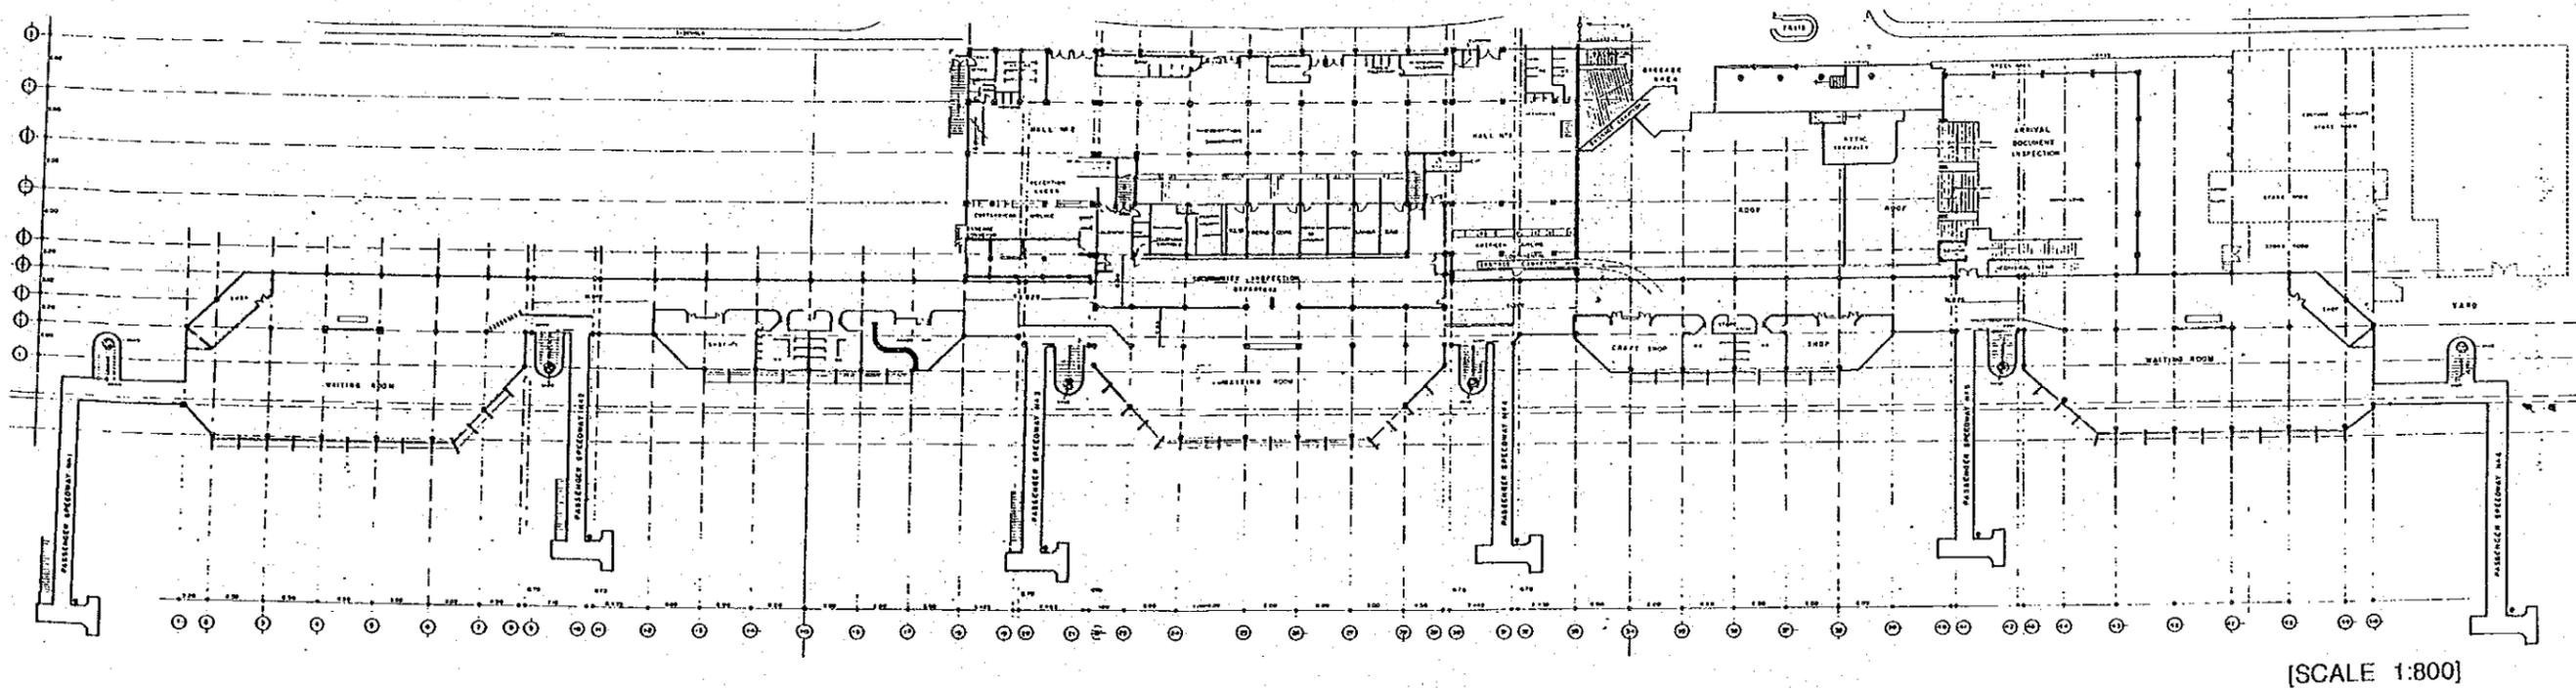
Existing Floor Plan of International Passenger Terminal Building (First Floor)
